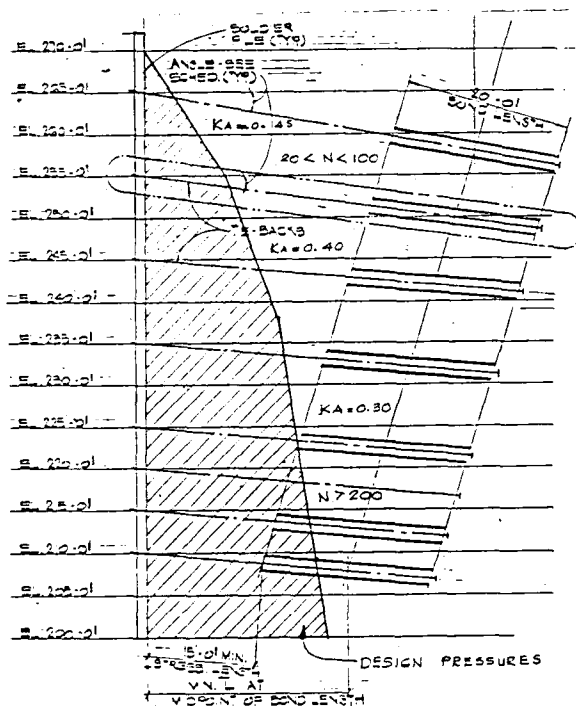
(b) Section thru Tied Anchor Wall including Design Pressures
